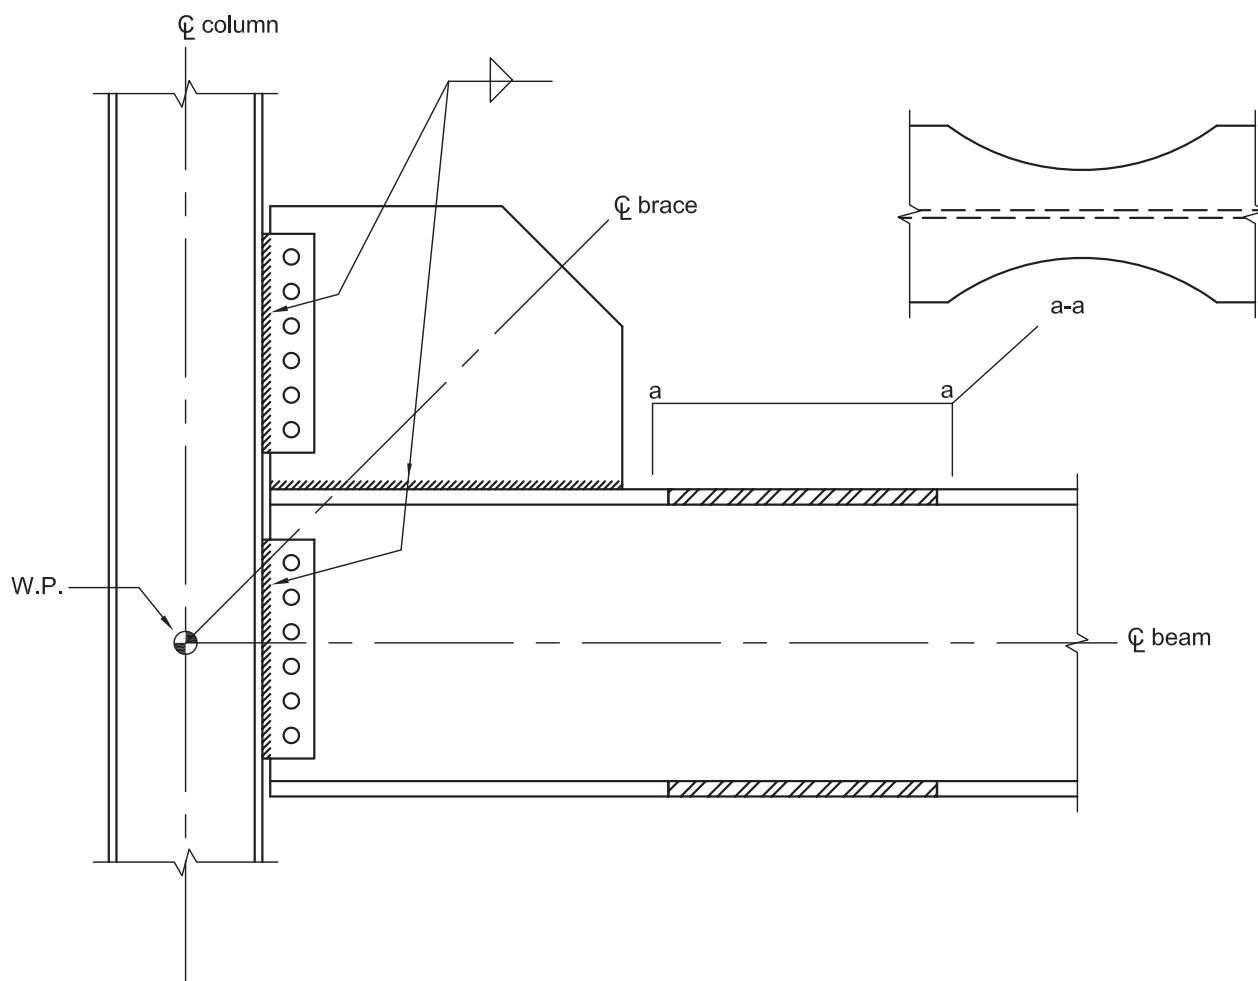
Reduced beam section (RBS) to control distortional forces.
